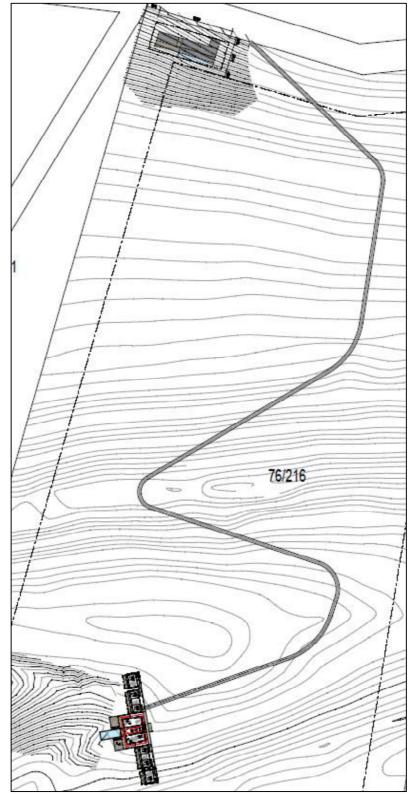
NEW PROPOSED INTERNAL ACCESS ROAD
